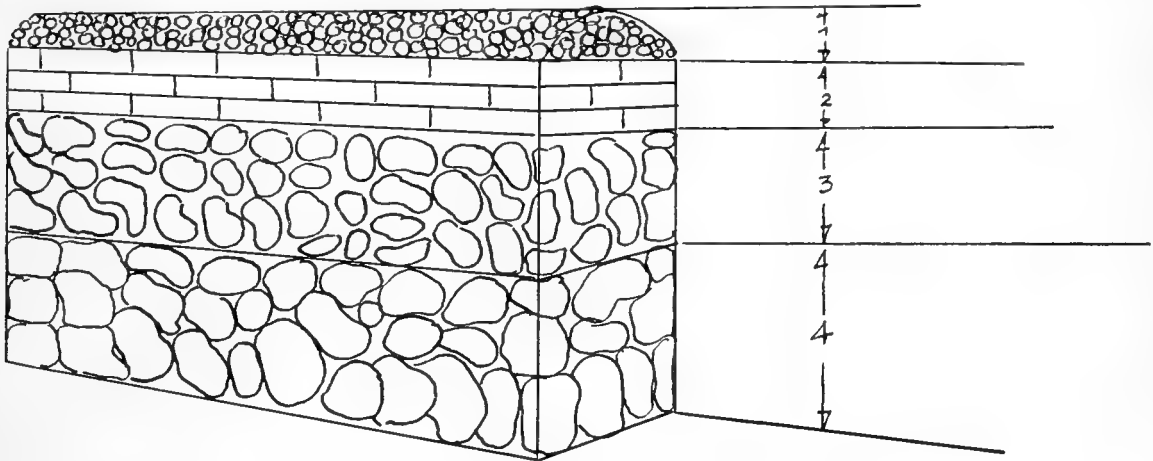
Well-made masonry and adobe-brick wall in Cherán.
